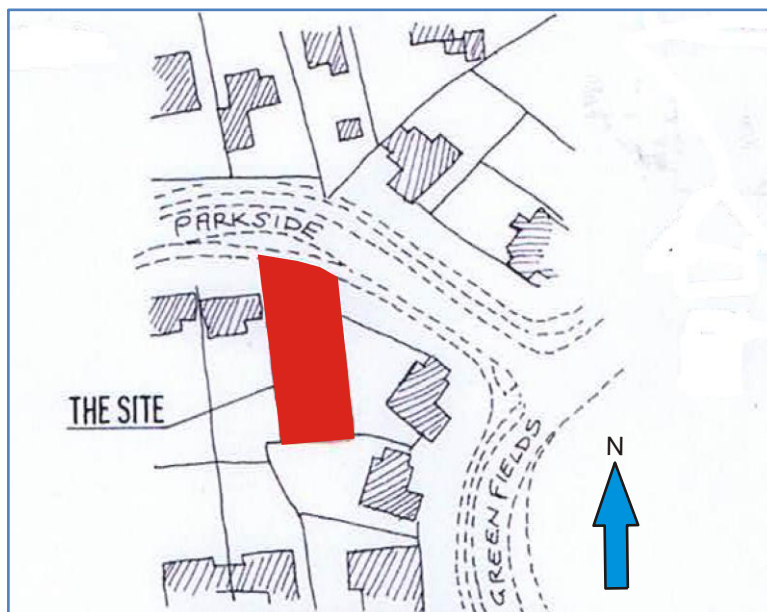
Site location at an original scale of 1:1,250, (extract from Architects plan)
